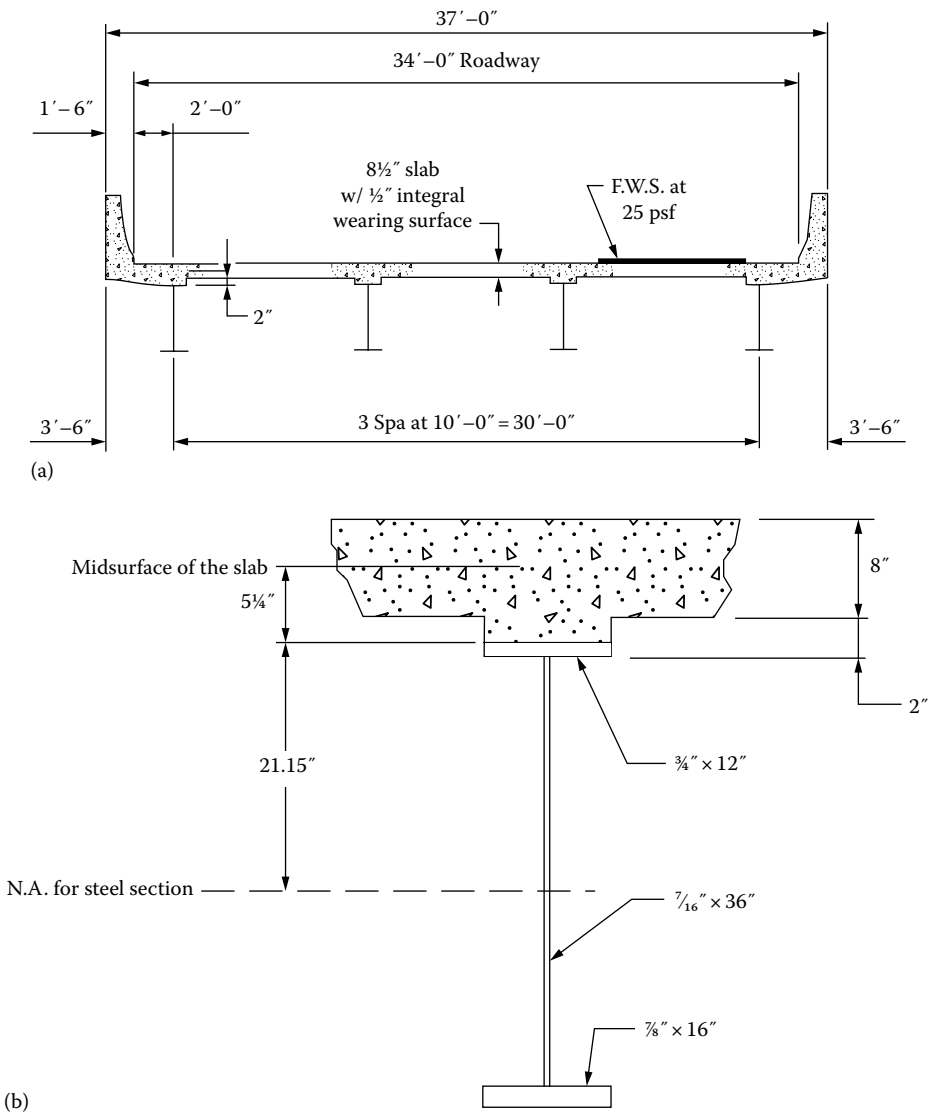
Concrete deck-steel girder bridge superstructure for Example 6.3. (a) Bridge cross section and (b) composite girder details (slab reinforcement not shown).
